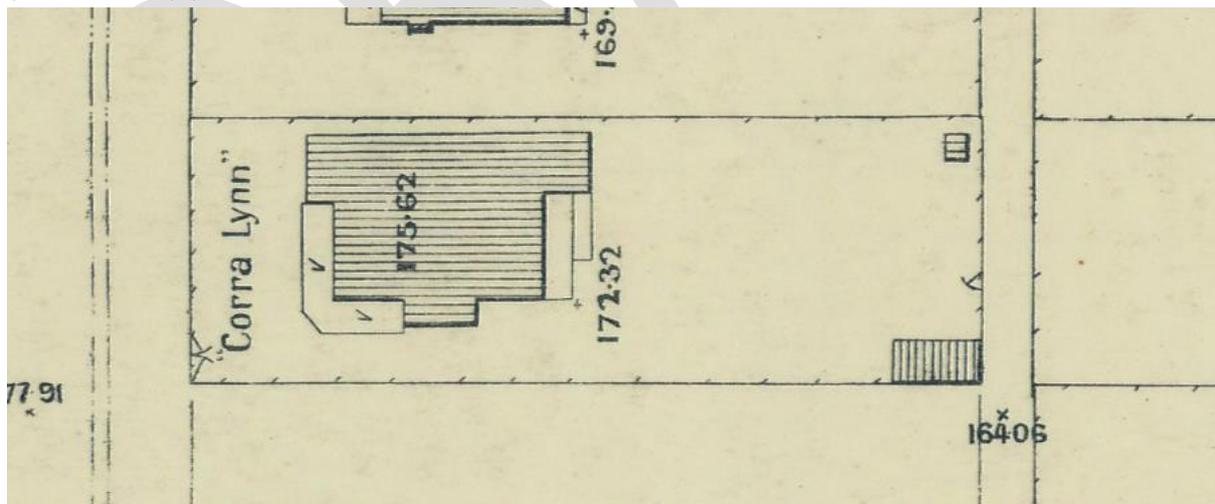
The smaller of the two outbuildings is most likely the outside toilet, accessed for waste disposal via a gate to the rear lane; the MMBW connected the sewerage to this area in 1920 (Built Heritage 2015: 10).
